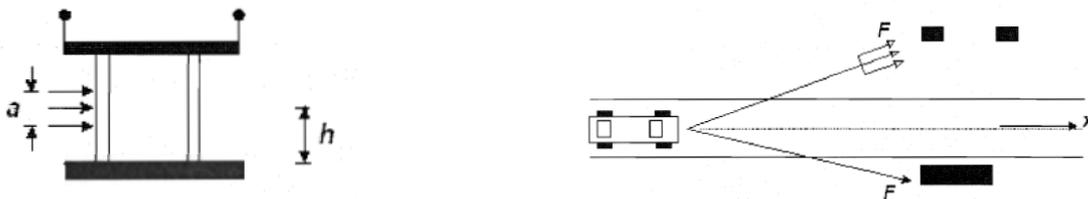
Collision force on supporting substructures near traffic lanes for bridges and supporting structures for buildings (Eurocode 1 2006)
